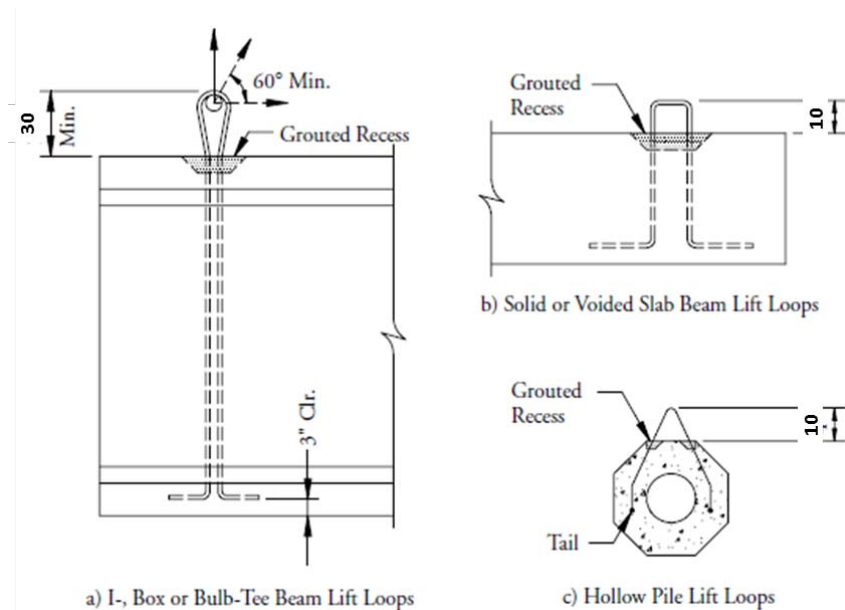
Typical lift-loop configurations (PCI Bridge design manual)
